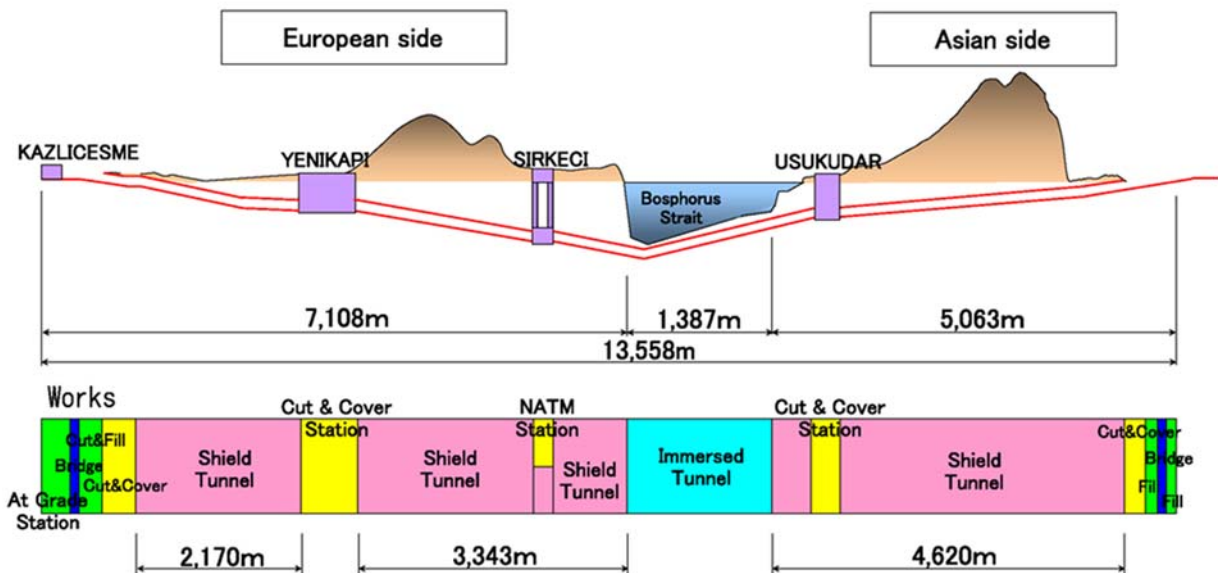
Overall longitudinal section of the project including the tunnel across the Strait
